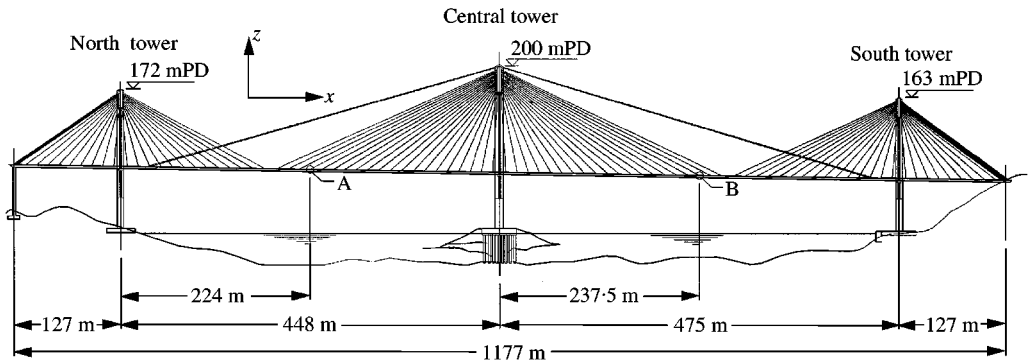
Configuration of long span cable-stayed bridge used in case study.
